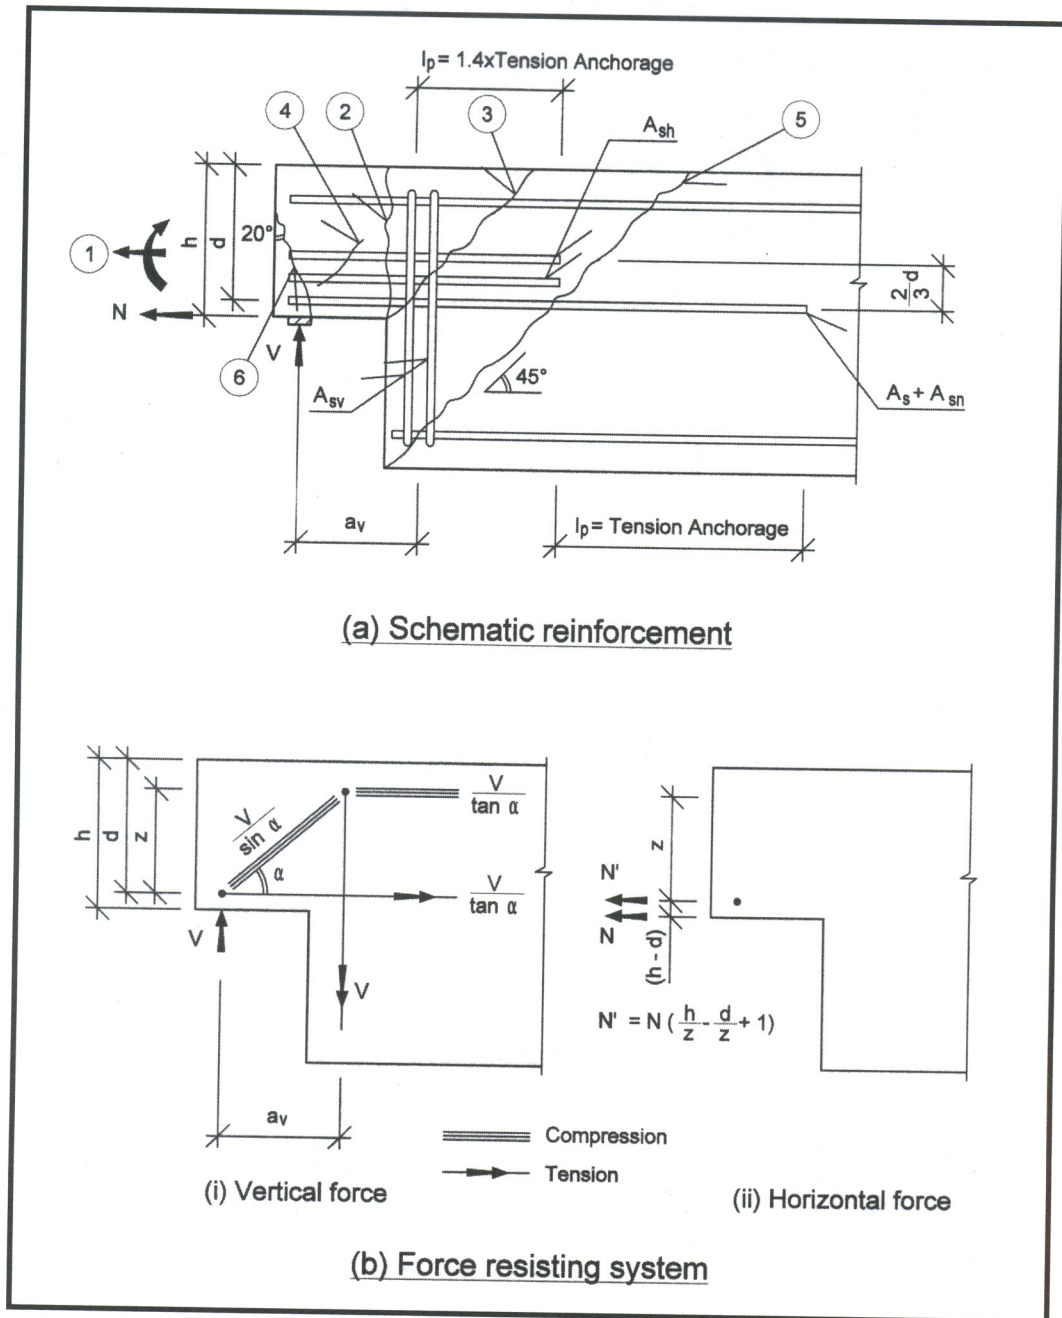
Reinforcement And Force Resisting System In Beam Half Joint
